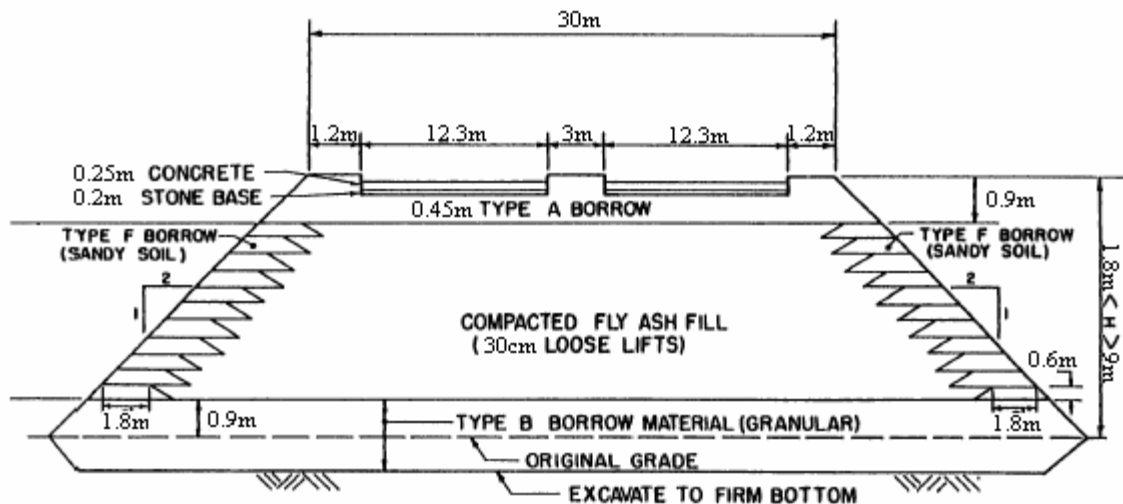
Typical fly Ash embankment section in the I-495 and Edgemoor road interchange, Delaware.
